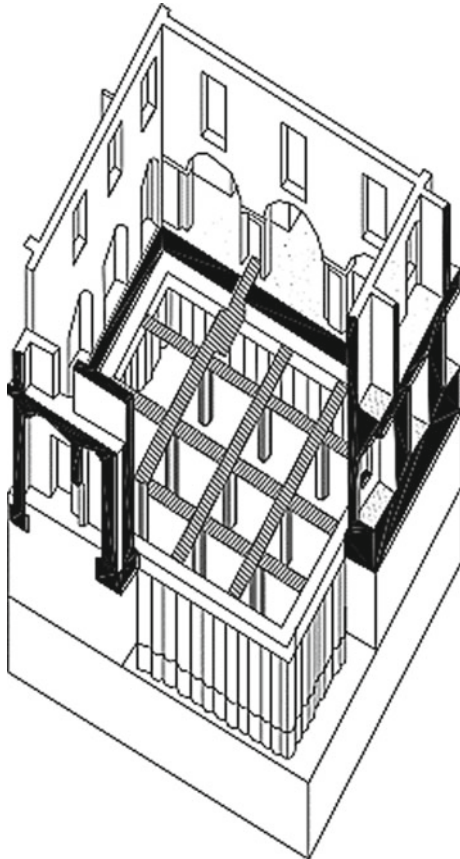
Ground floor fortification structure to build the basement. *Source* Umran and George (1997)
